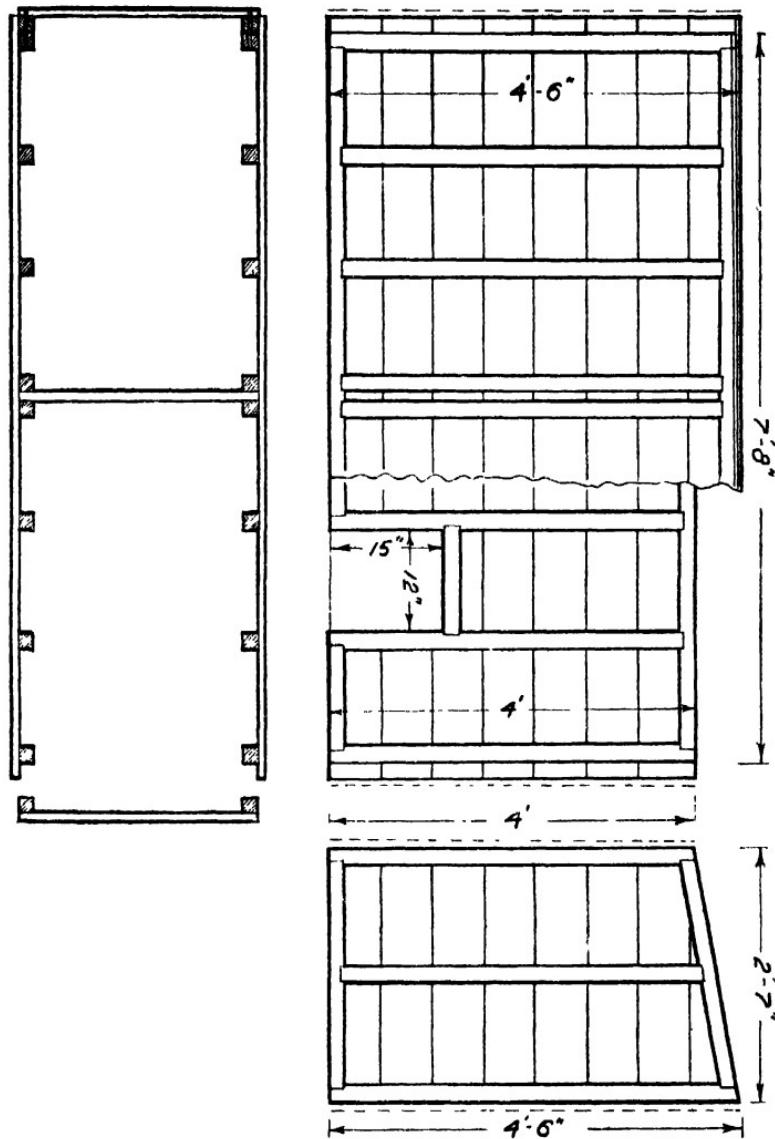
SIZES AND CONSTRUCTION OF THE FOUR FRAMES, AND PLAN VIEW SHOWING HOW PARTS ARE BOLTED TOGETHER.
